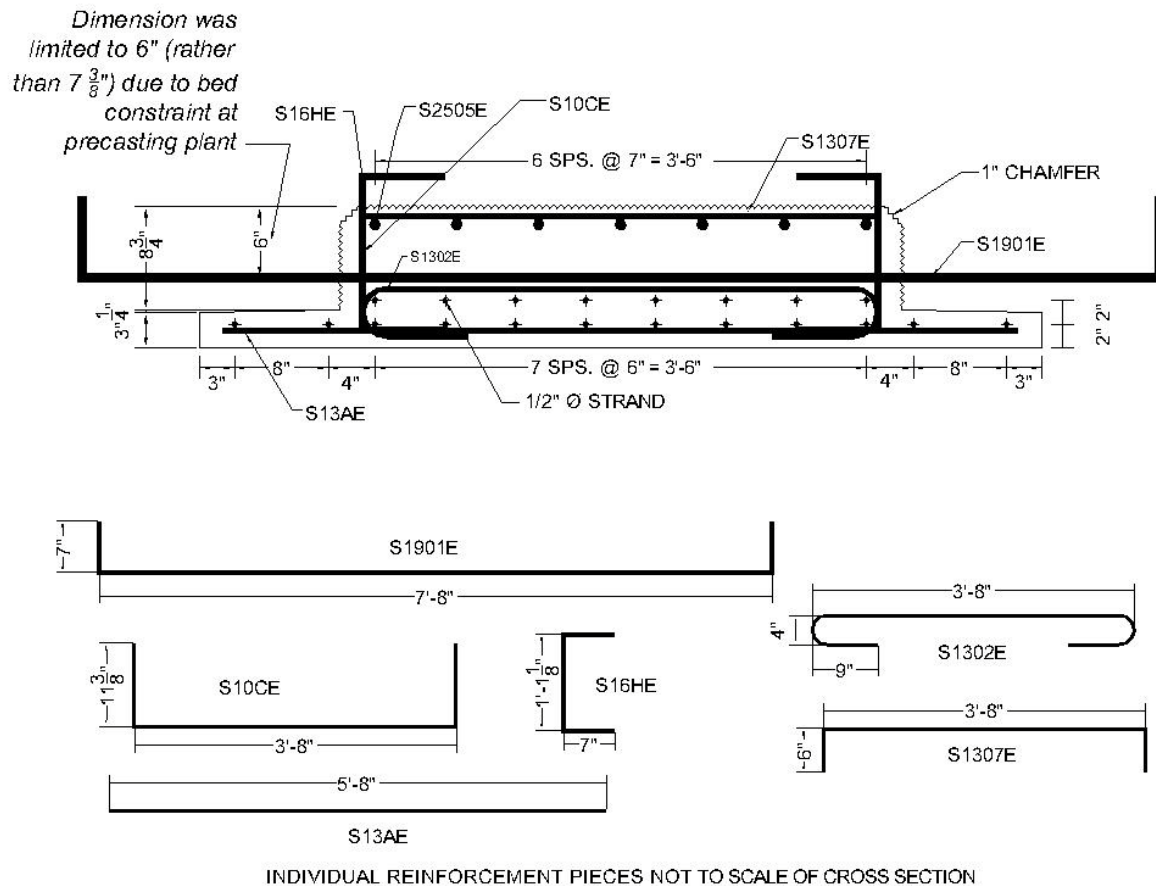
Cross section and individual reinforcement details for west end of precast beam 1N
